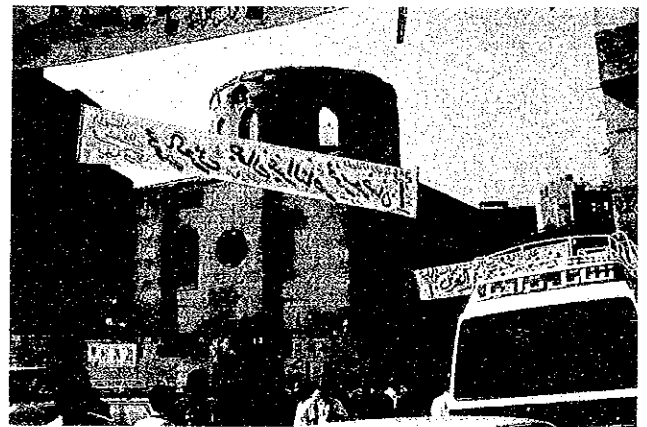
Old stone masonry mosque with its dome collapsed
